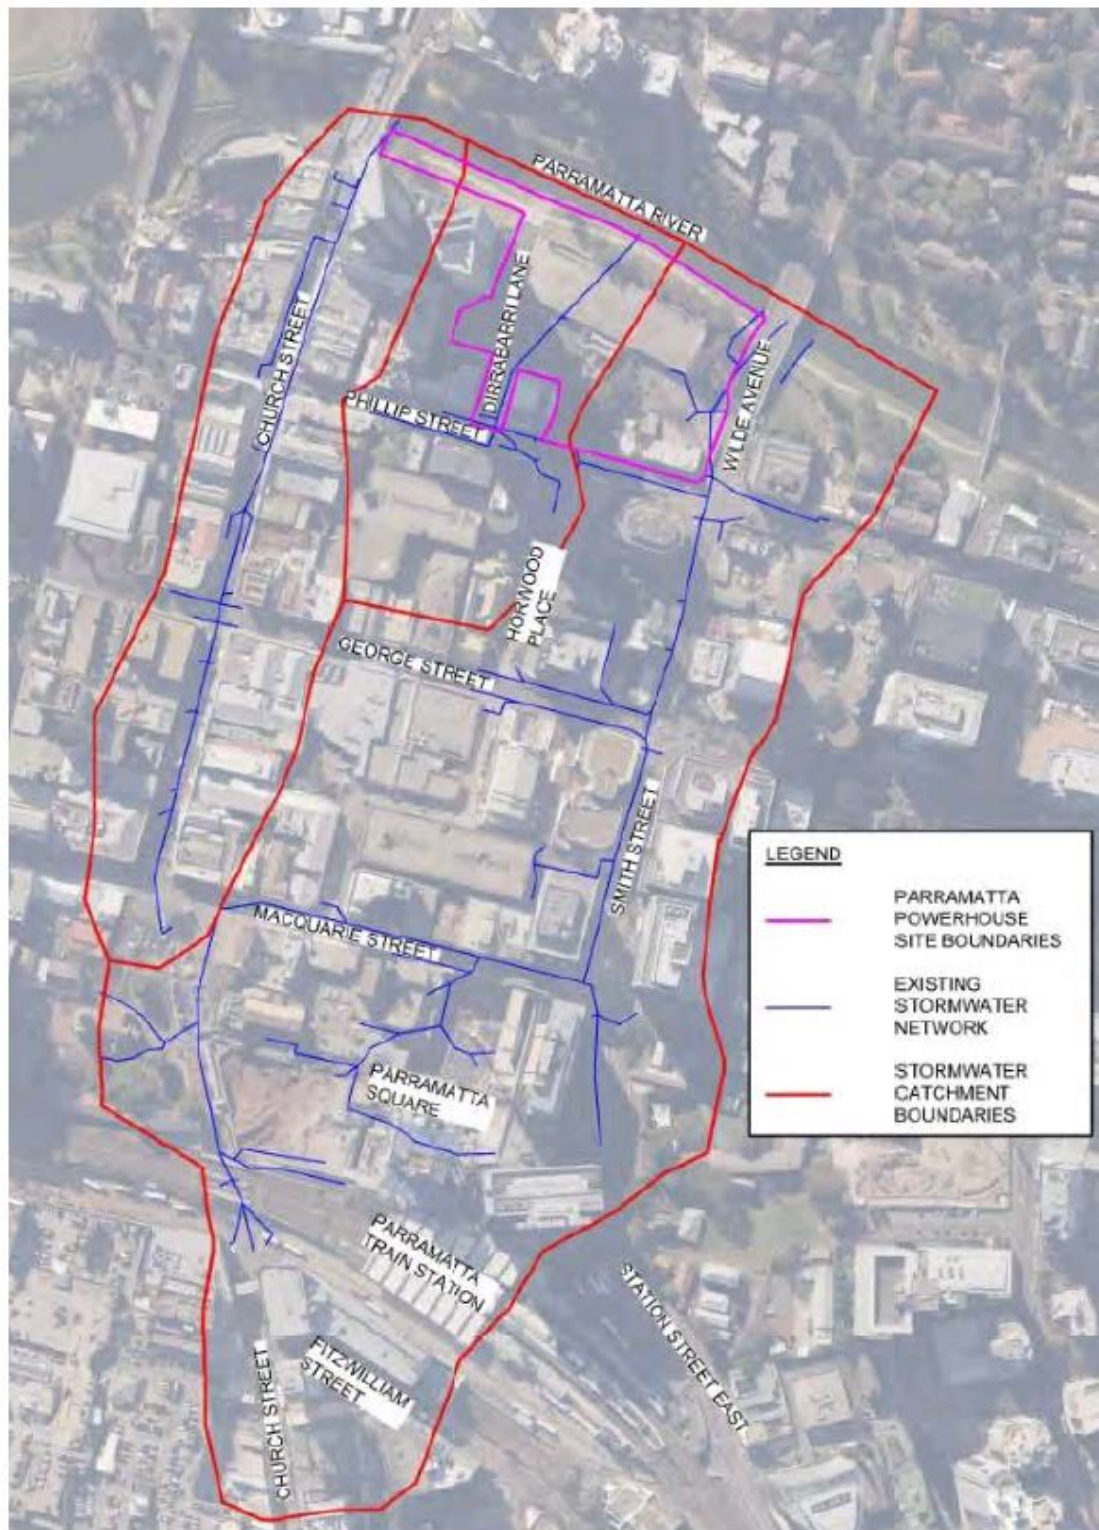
Existing stormwater drainage infrastructure catchment plan for areas in close proximity to the Powerhouse Parramatta development site
